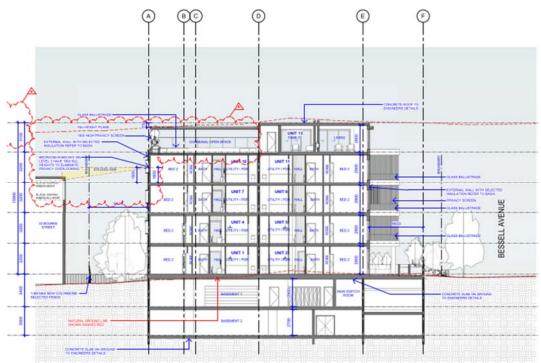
Section B-B of the proposed Development (\*Source: PRD Architecture)
